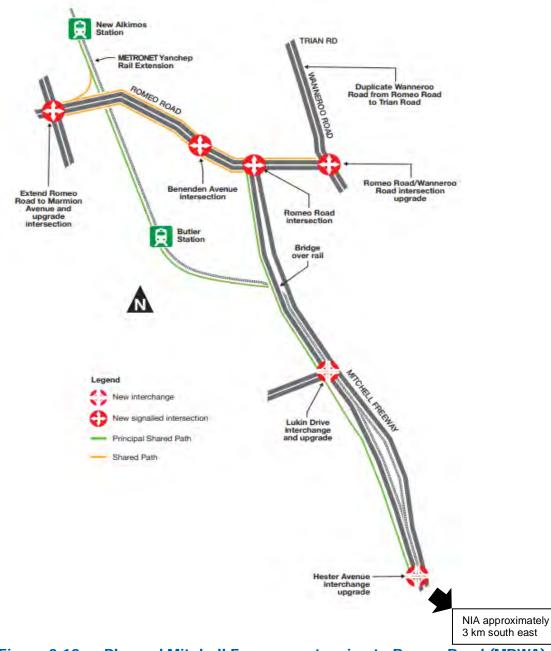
Planned Mitchell Freeway extension to Romeo Road (MRWA)
